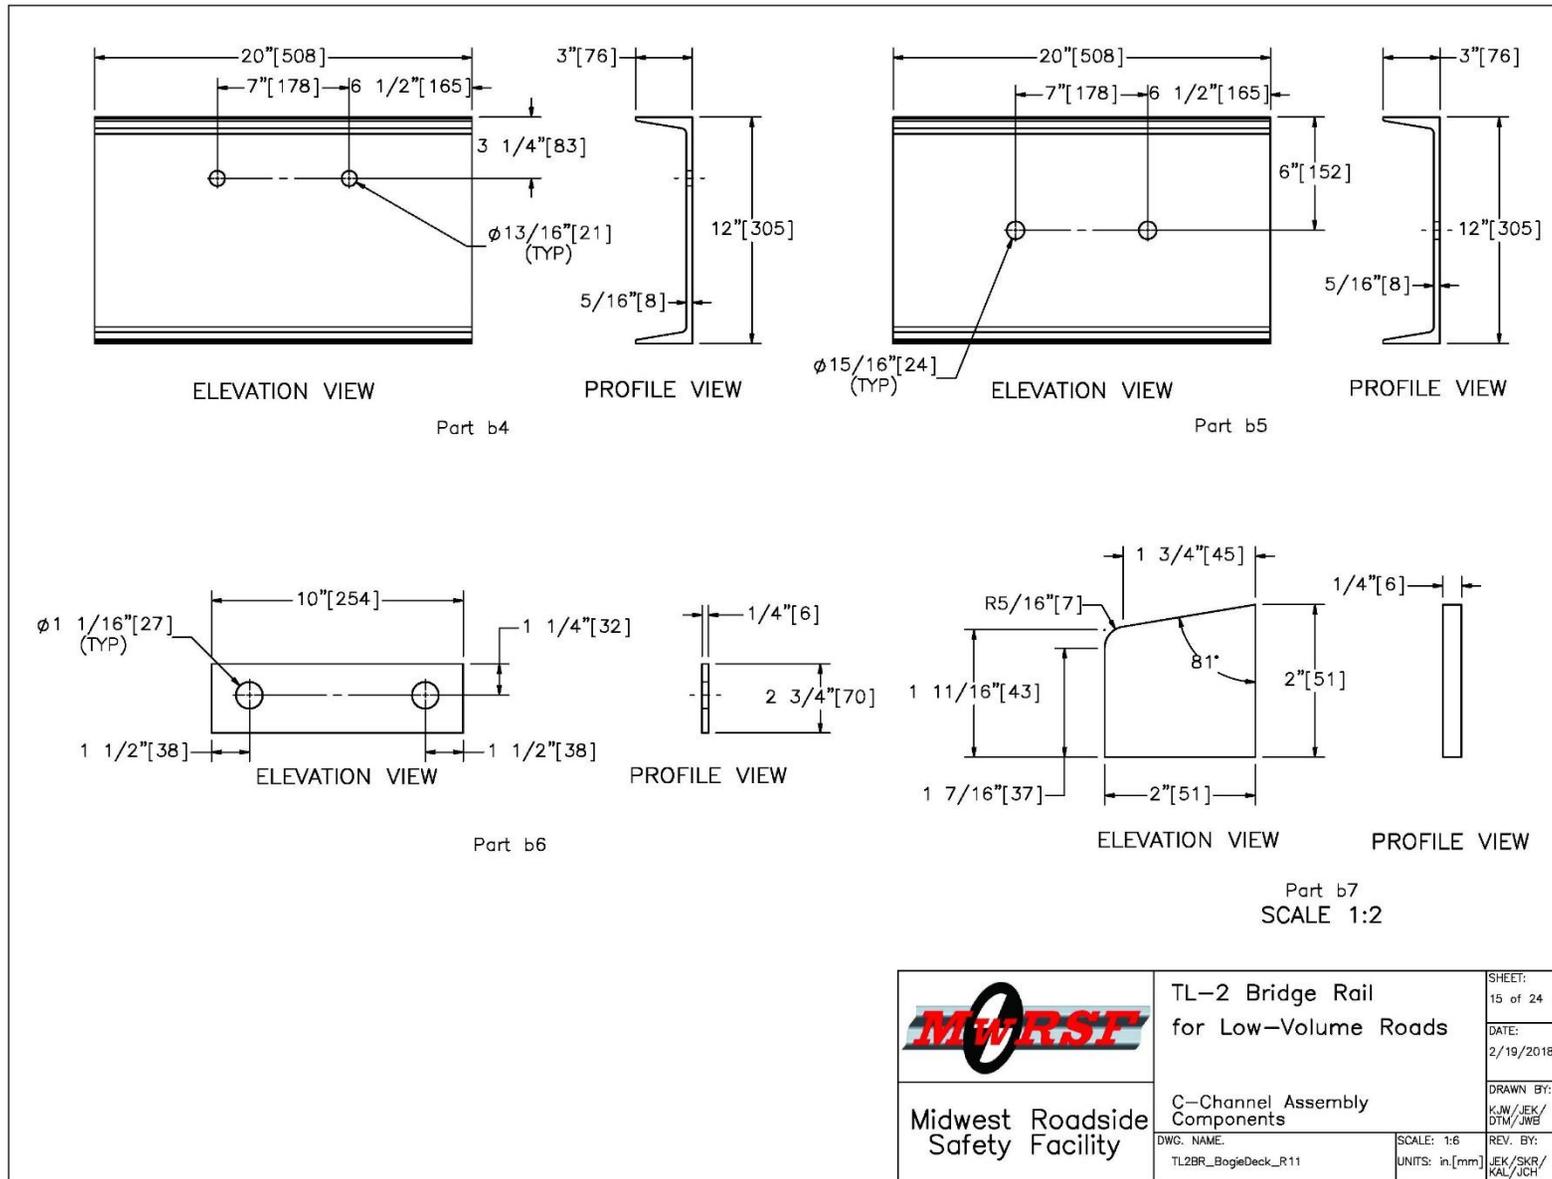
Bogie Testing Matrix and Setup, C-Channel Assembly Components
